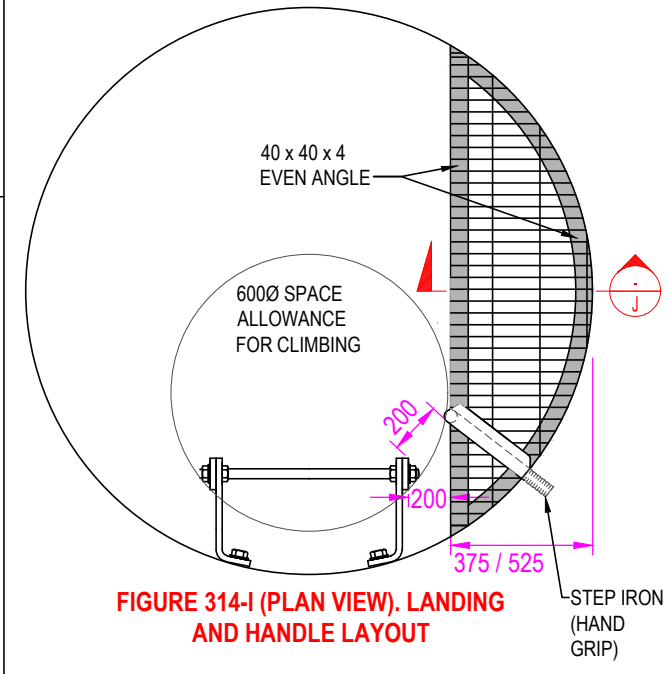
I (PLAN VIEW). LANDING AND HANDLE LAYOUT
